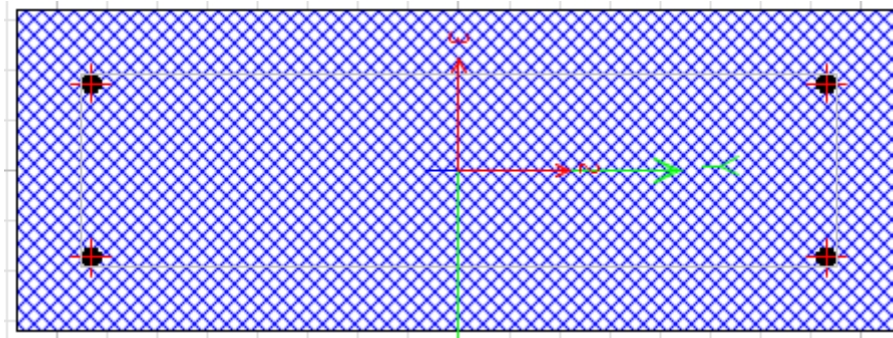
Cross section detail for the ACI 318M-14 (Computers and Structures, 2016).
